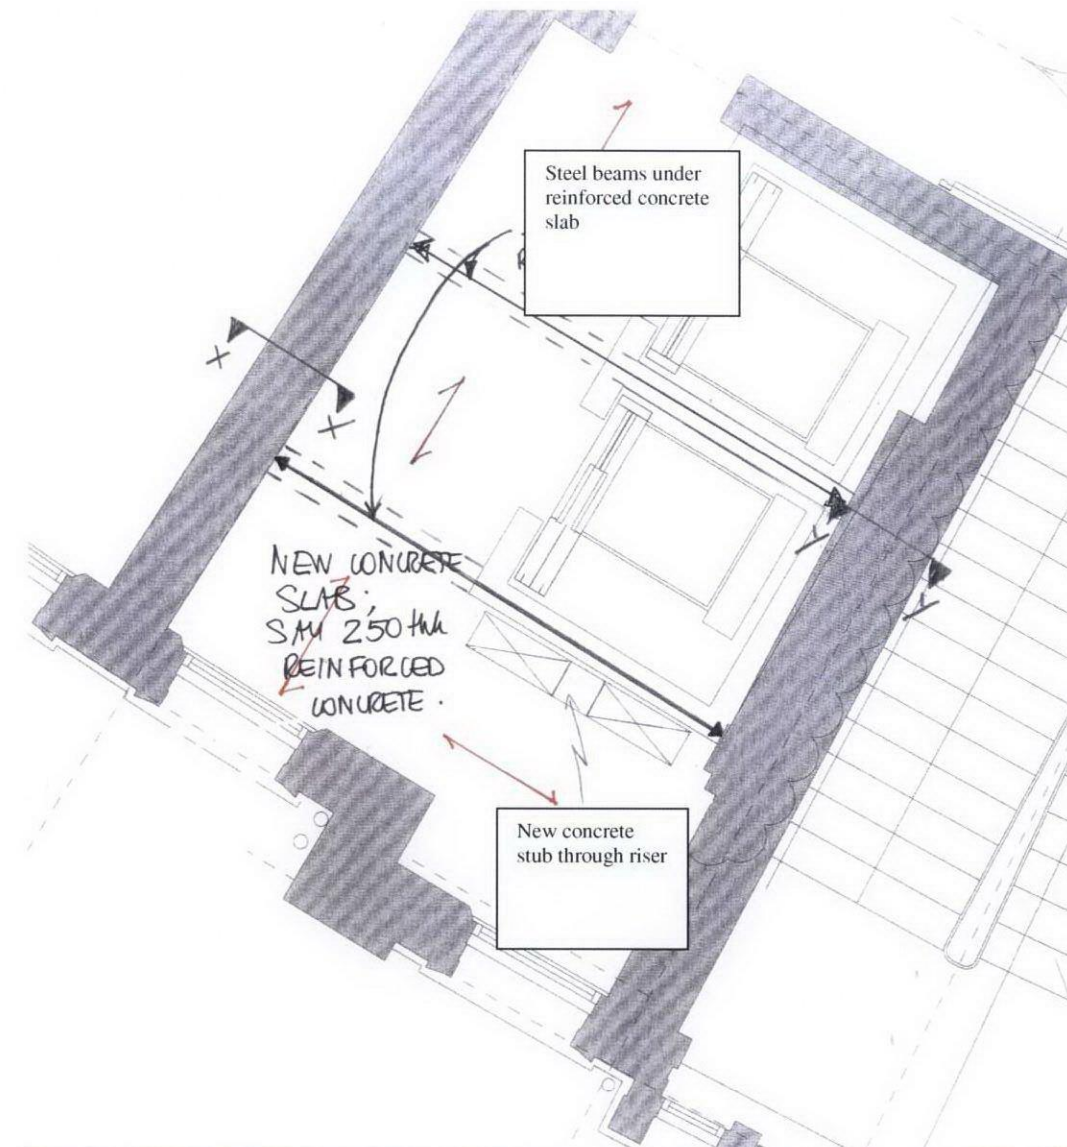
Indicative sketch of the new RC slab around the new lifts (SK062)
